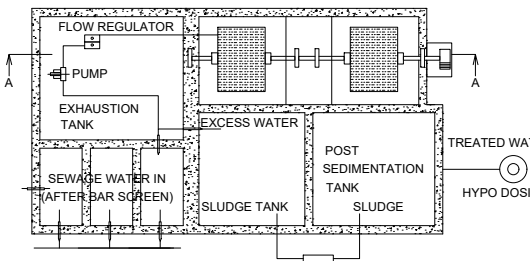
DETAIL PLAN FOR ORGANIC RECYCLING SYSTEM & SUMP
